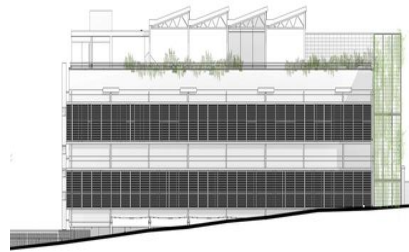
D: 78 Corlett Drive west elevation<sup>66</sup>.
